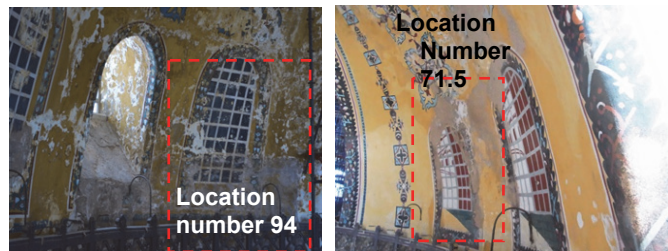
Degradation of the inner wall at NW exedra (left) and NE exedra (right)
